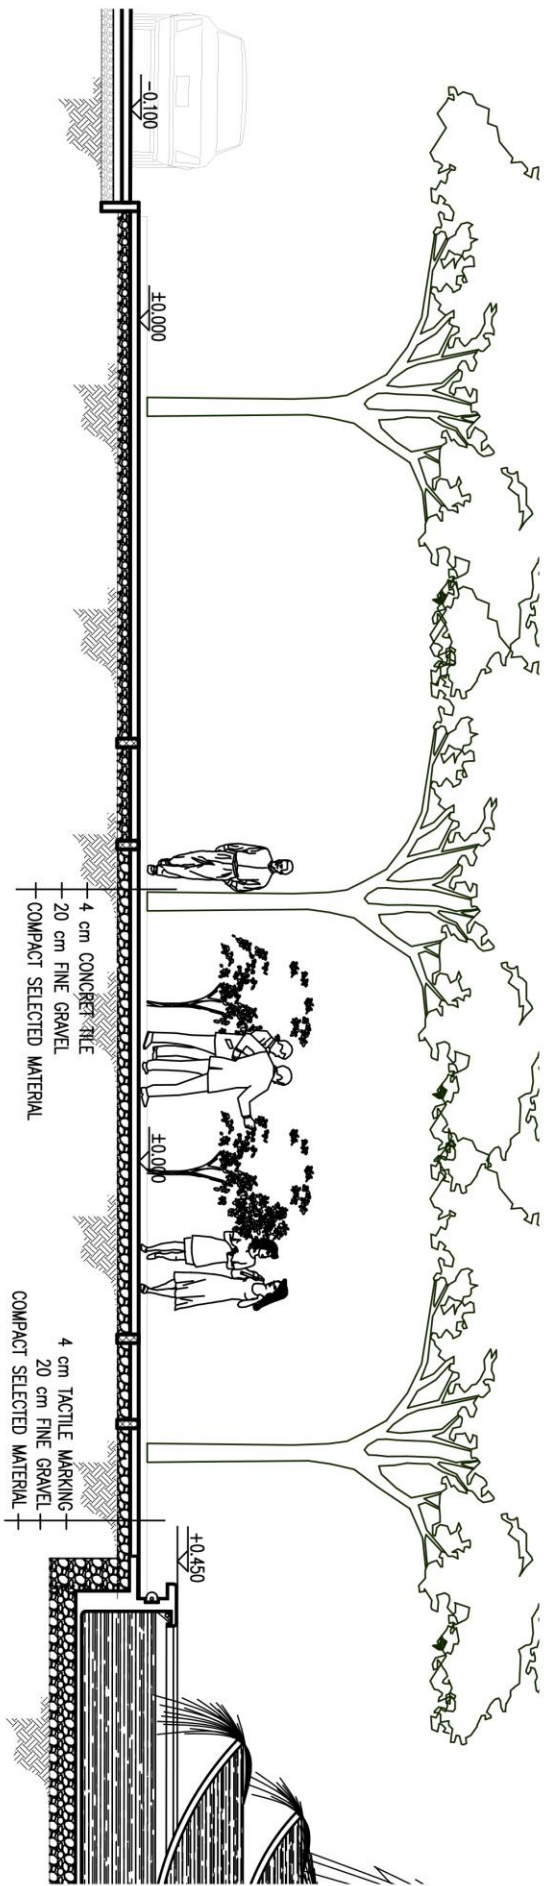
Main Entrance/ Parking/ Plaza/Gateway
